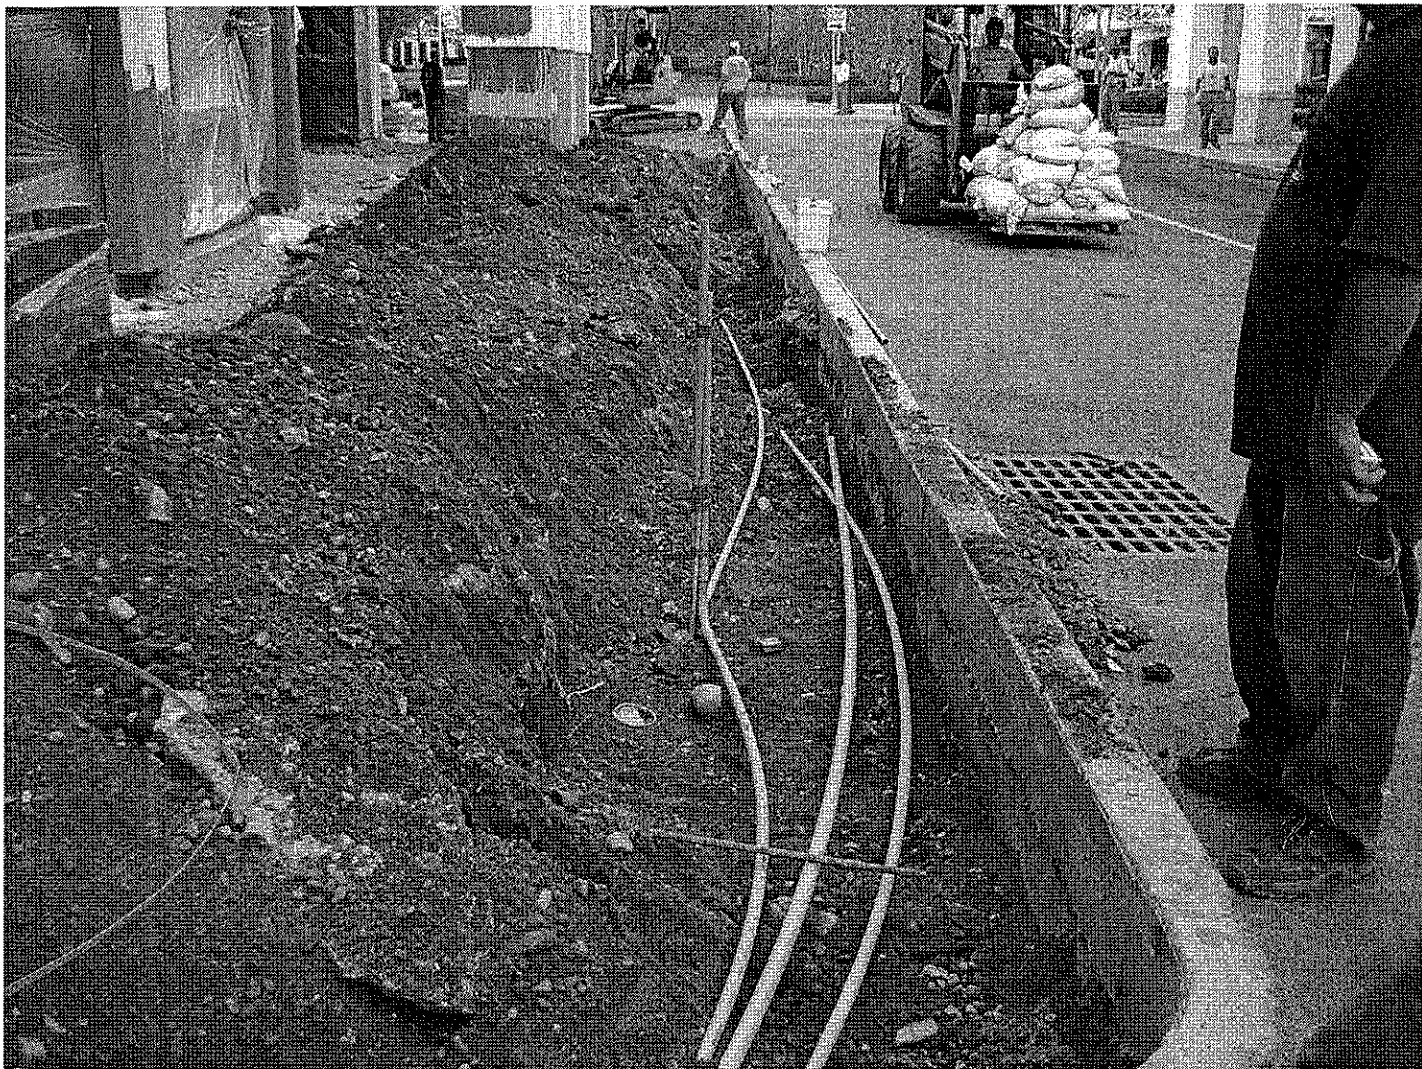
Electric piping for Light Poles South of building 3 sidewalk
